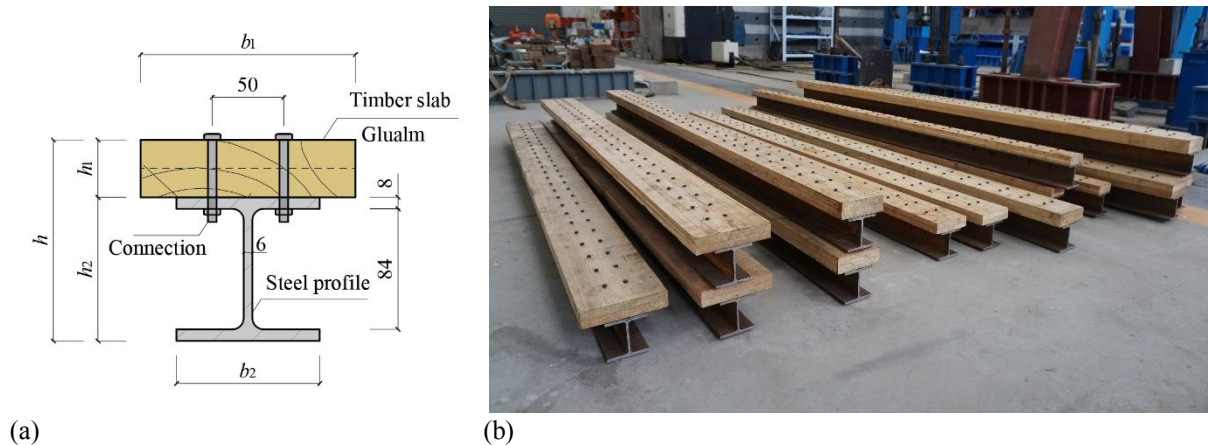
Configuration of specimens used in test (all dimensions are in mm): (a) sectional dimensions, (b) perspective view.
